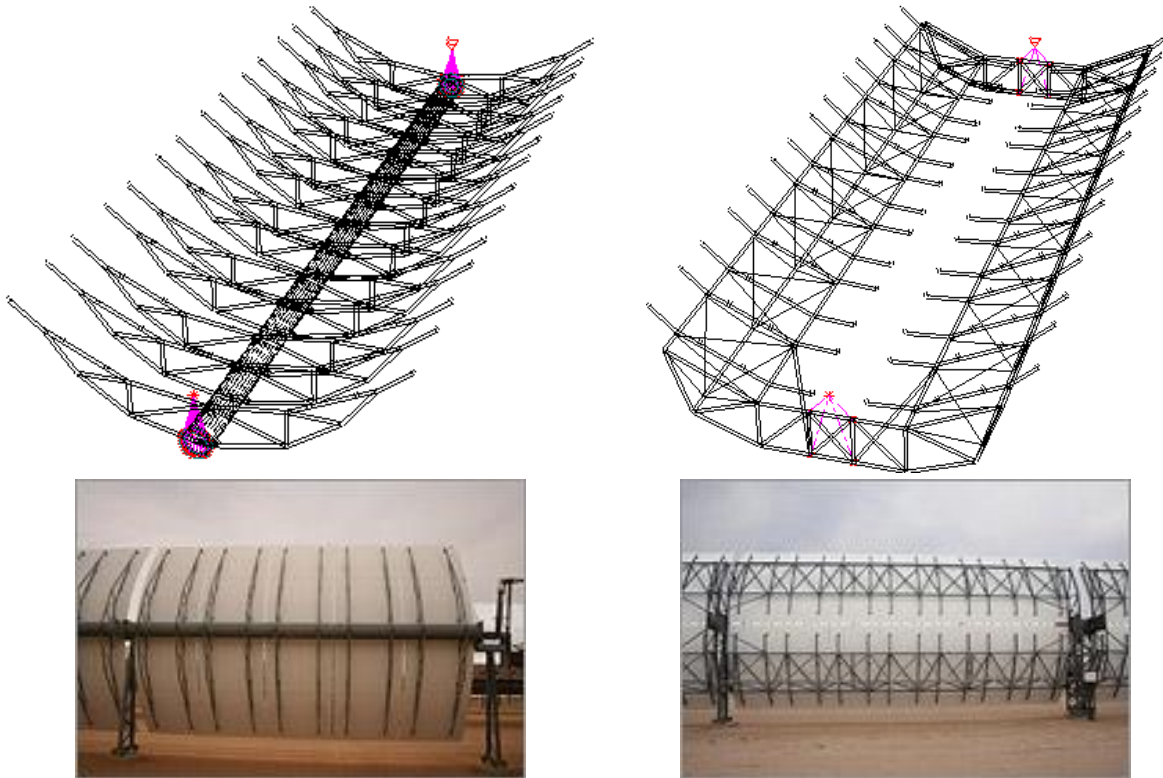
Solar collector (LS-3) assembly (source: Geyer, DLR)
